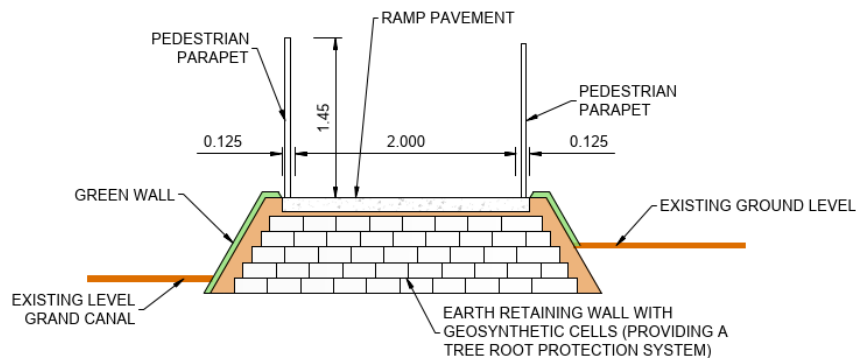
Kimmage 04 – Typical Cross Section of earth embankment ramp
